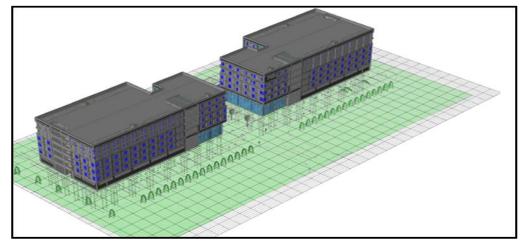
Europe out sourcing center model in China (Source: model provided RIB iTWO)
